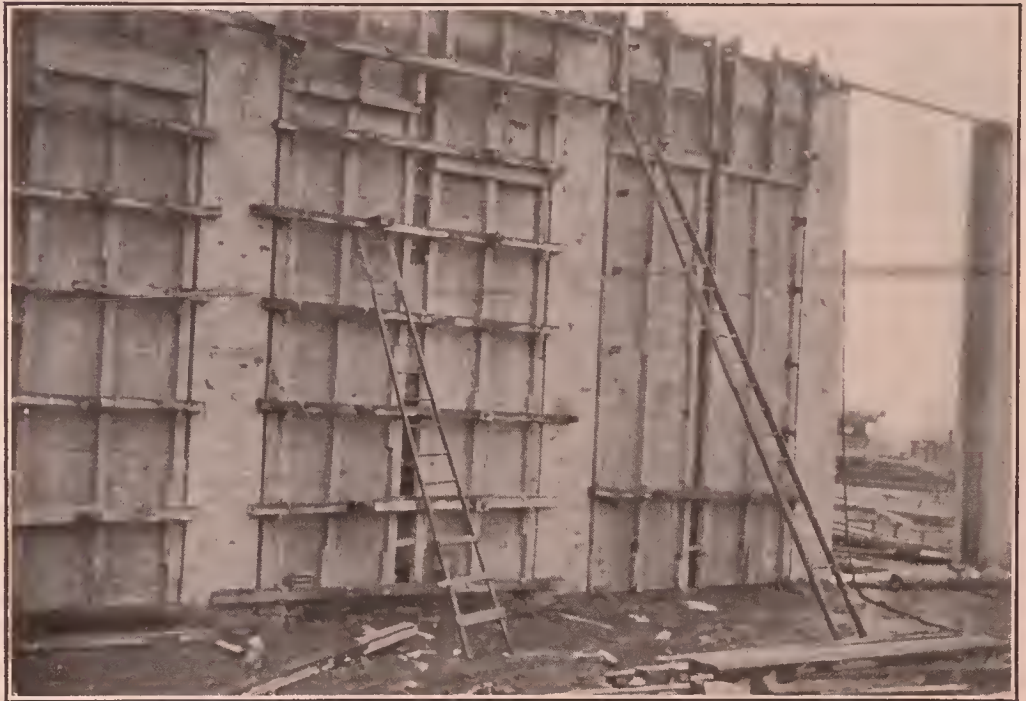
Panel Wall Forms for The Atlas Portland Cement Company Building.
